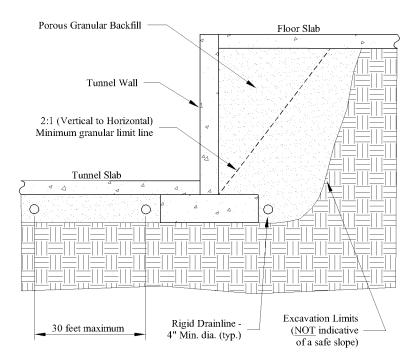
Typical Lateral Earth Pressure Section for Below Grade Tunnels
